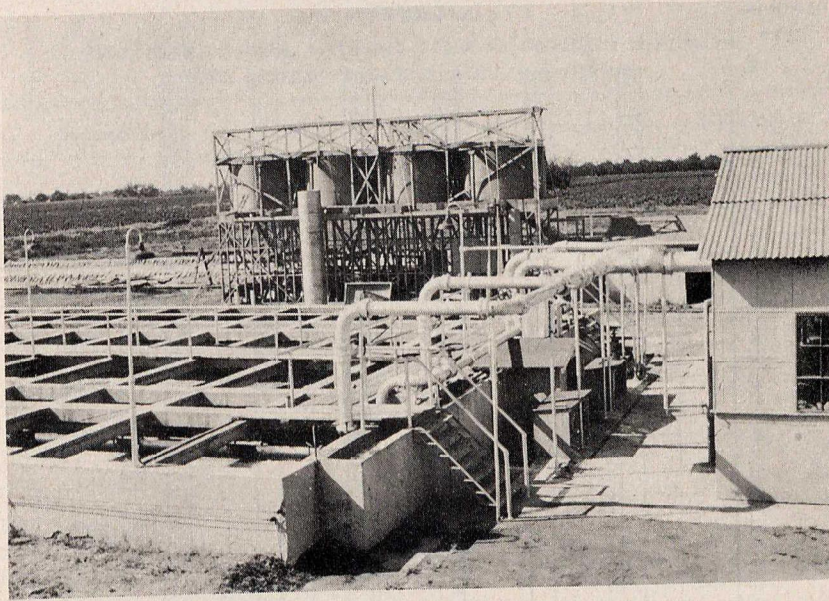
Elevated storage tanks, Lodi sewage treatment plant
